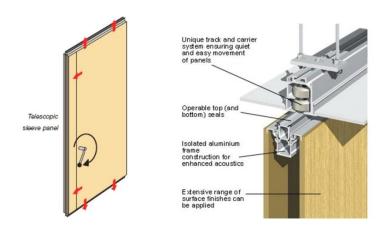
Movable Flexible Door Detail and Reveal Door Structural Rail(URL:91)
